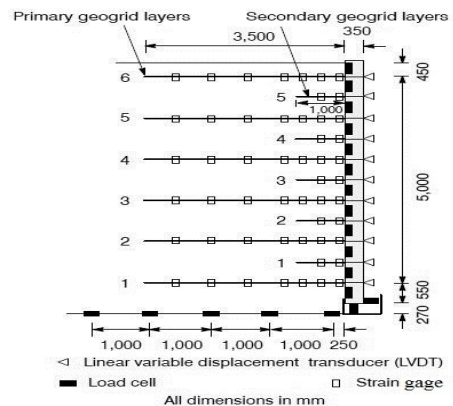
PWRI wall geometry (Ling et al, 2000)
